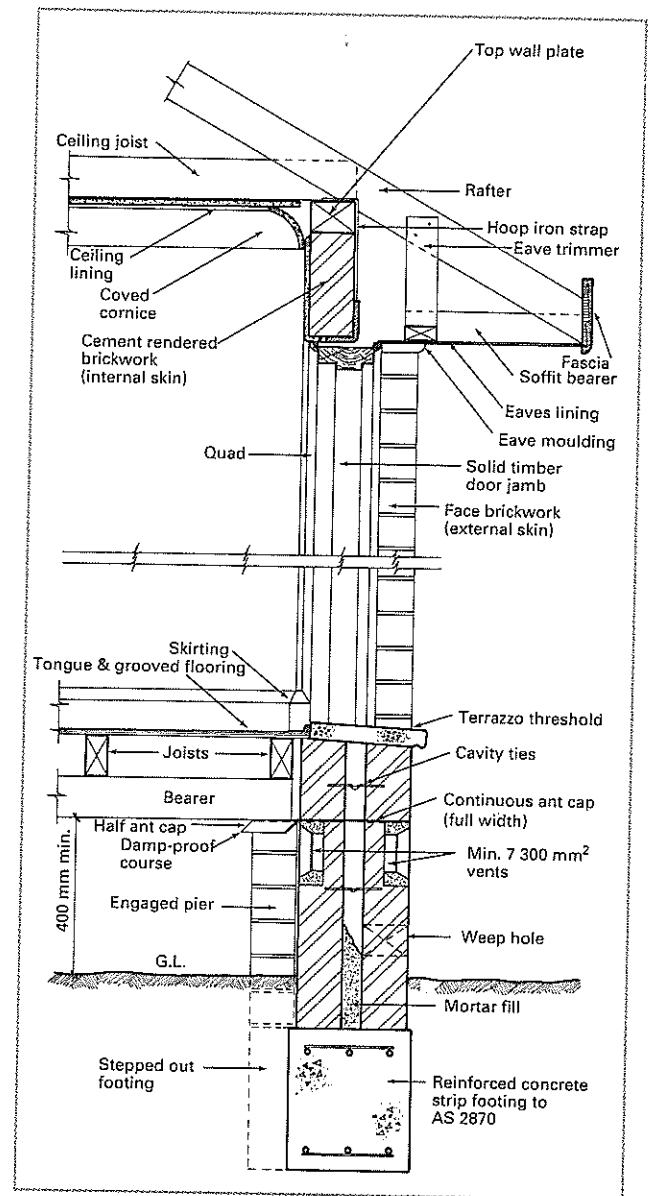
Vertical section through an external cavity brick wall and timber door jamb
